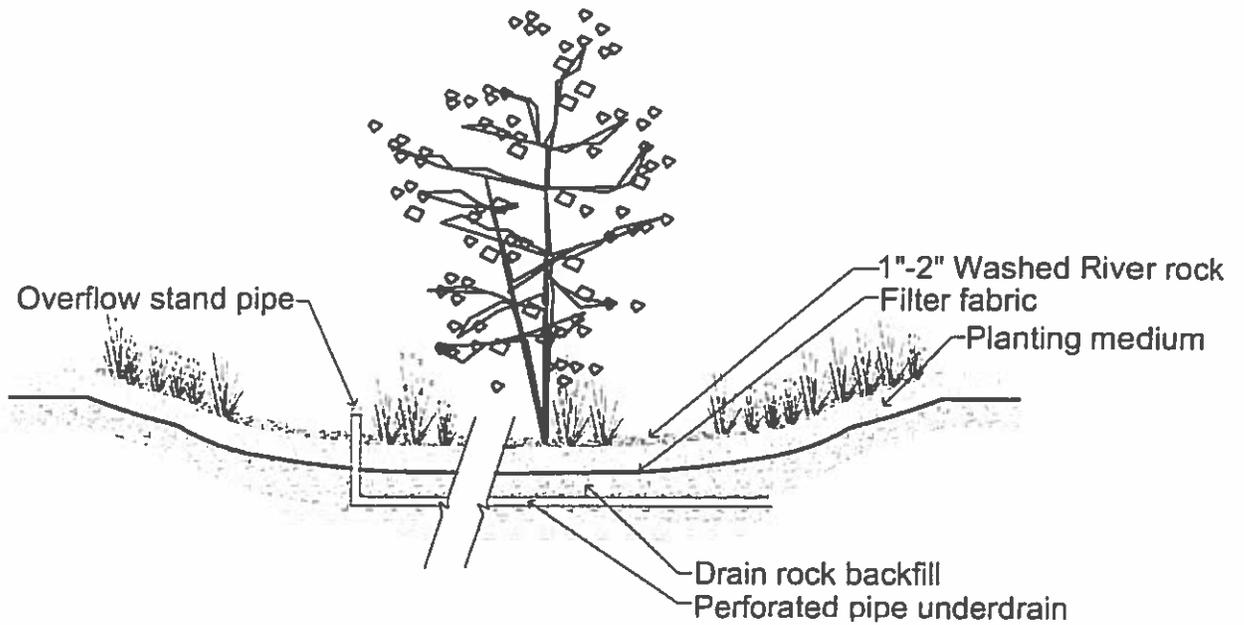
DRY DETENTION SECTION (EXAMPLE)
